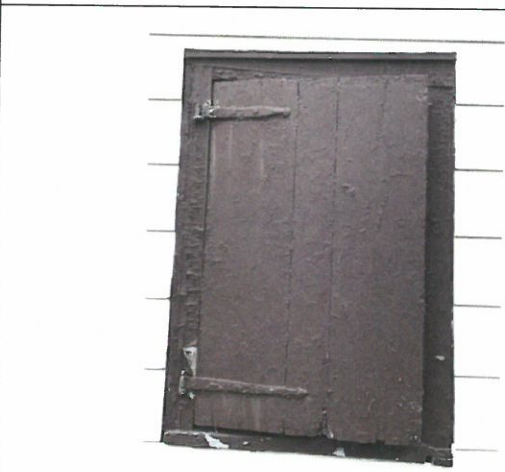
Area A, shutter and early hardware at window opening, south elevation.
